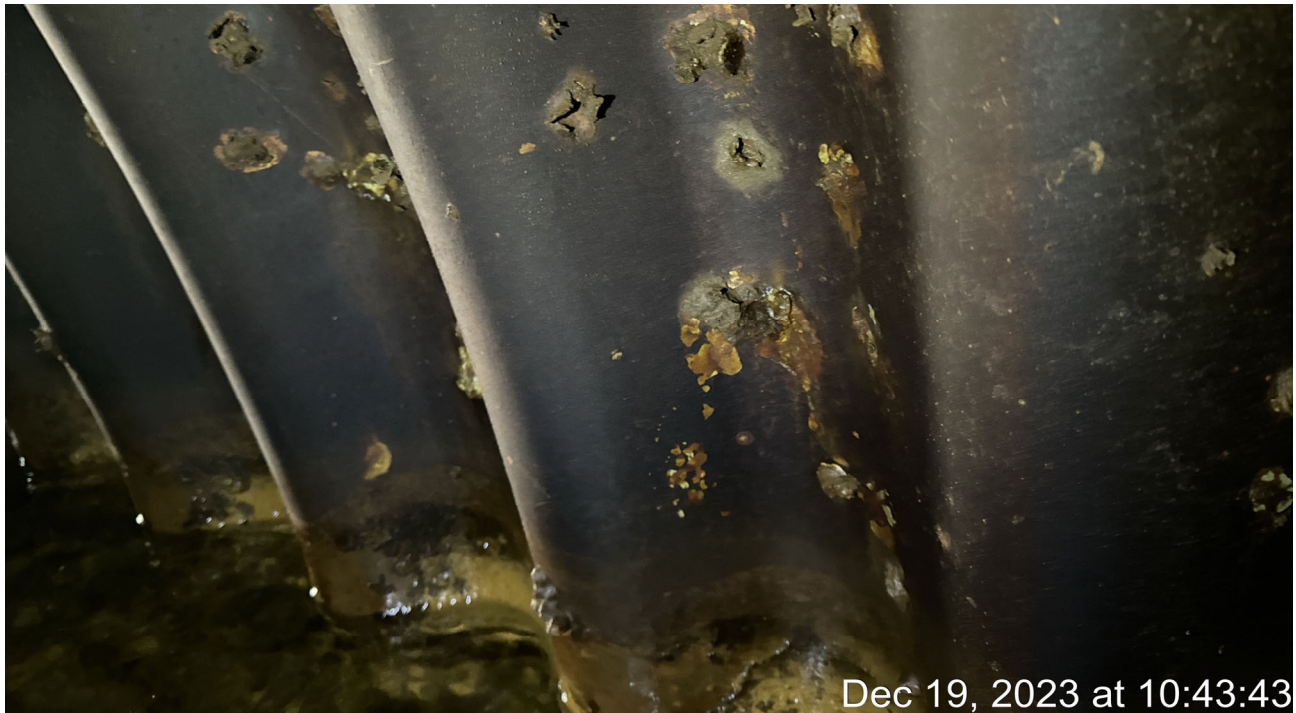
Heavy pitting and holes as observed on a portion of the half-arch culvert sidewalls.
